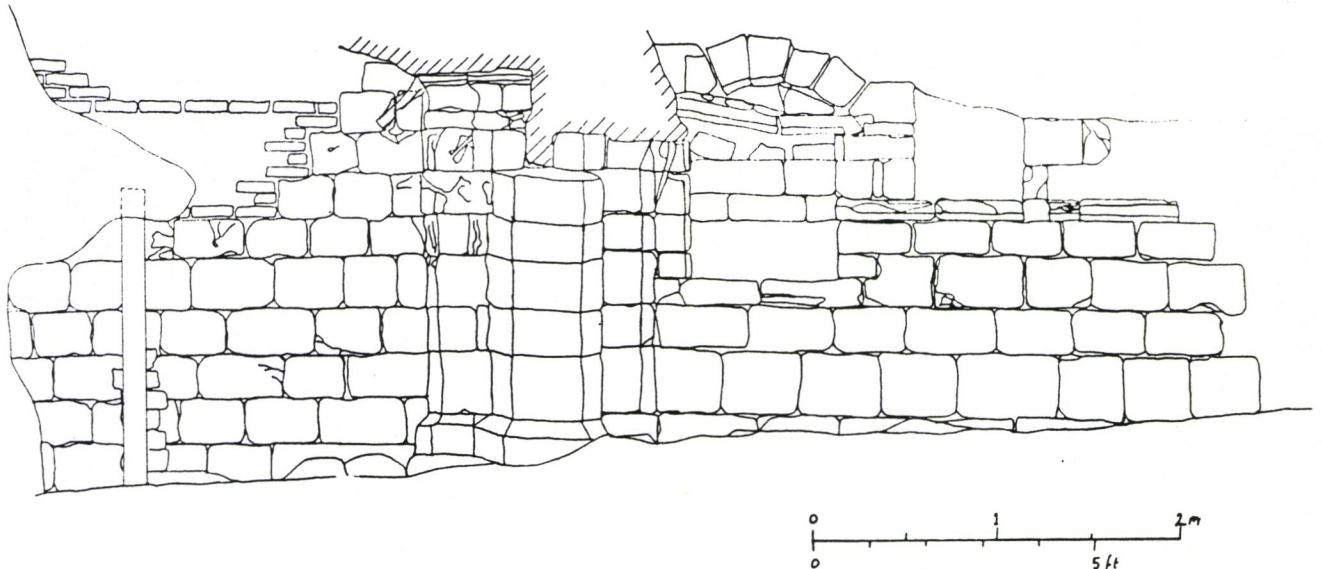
Baswich, St Thomas' priory: elevation of north transept wall
